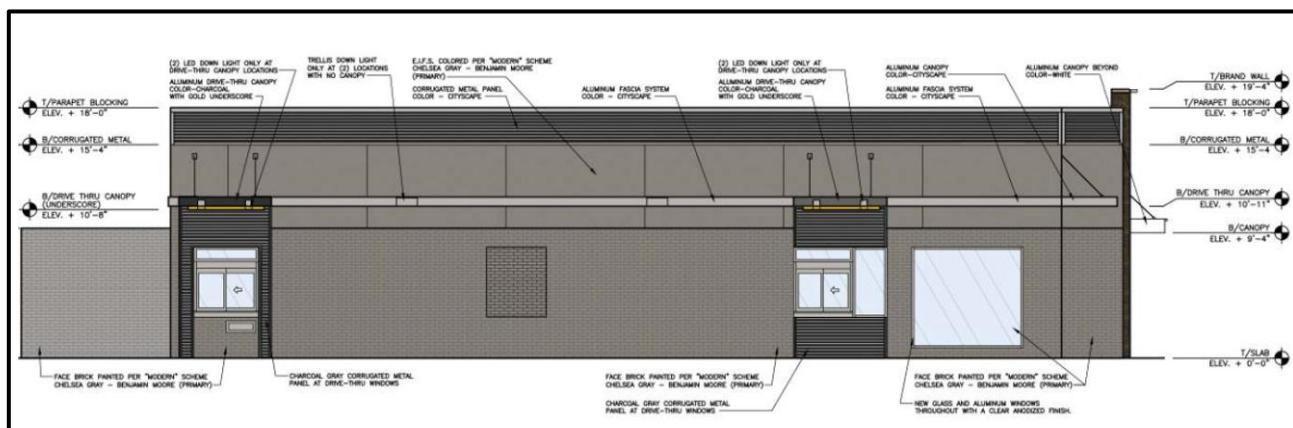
South Elevation seen by vehicles traveling north on Clarkson Road.
